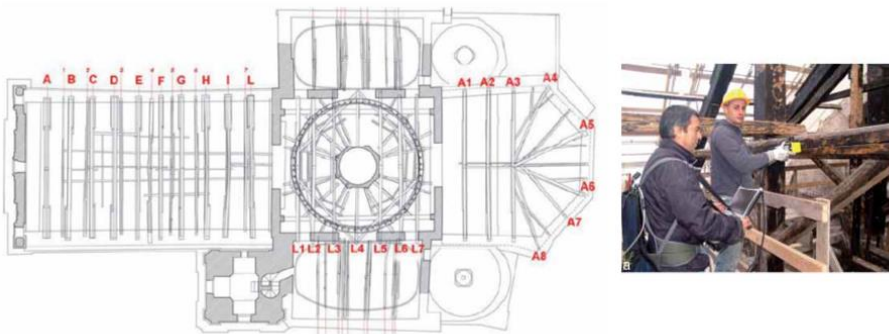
The roof planimetry: the red letters refer to the position of the wooden structures
